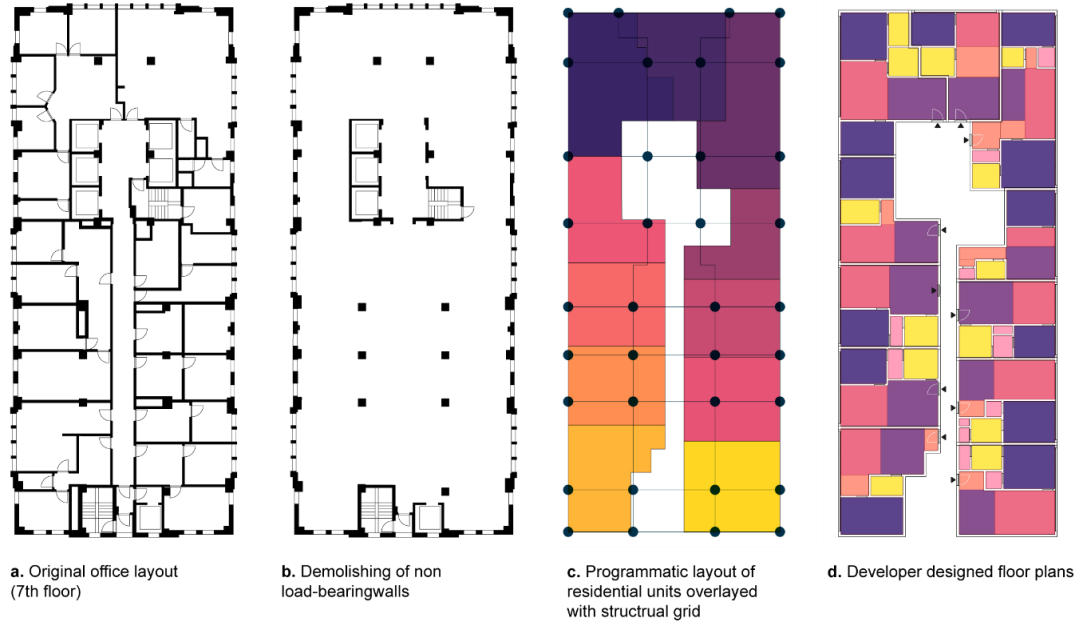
Real world office building converted into residential units. Seventh floor shown for evaluation of developer designed residential floor plans (Badger & Buchanan, 2023).
